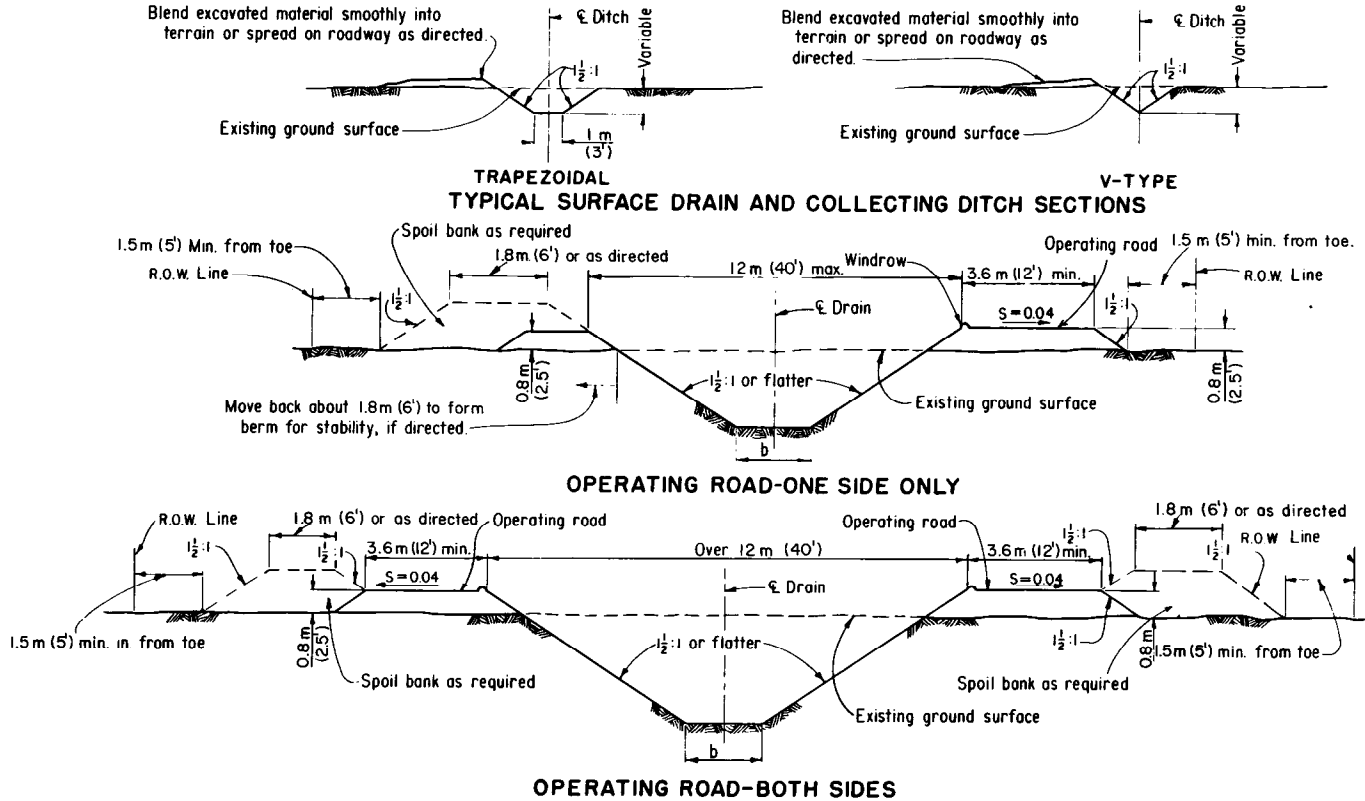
Typical drain and collecting ditch sections (sheet 2 of 2). Drawing 103-D-1661.
